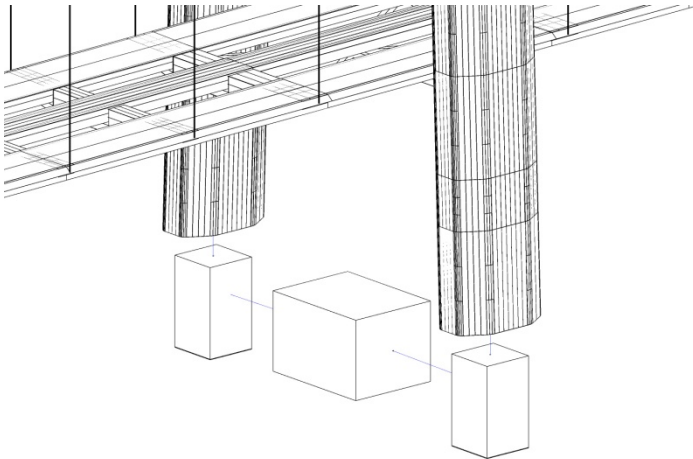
Messina Strait Bridge, geometry of the tower foundations
